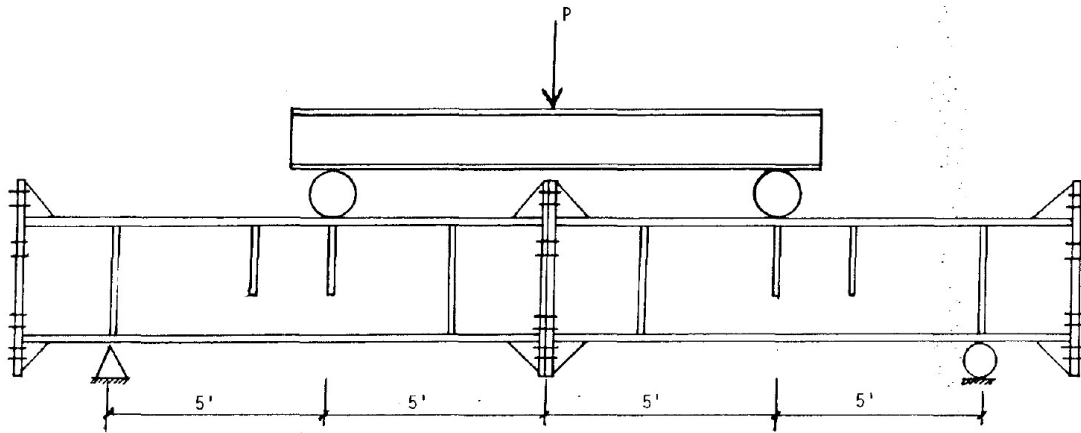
8ES-0.875-1-24 Specimen Dimensions [Ghassemieh, M., Kukreti, A., and Murray, T.M. (1983) *Inelastic Finite Element Analysis of Stiffened End-Plate Moment Connections*, Report No. FSEL/AISC 8302, School of Civil Engineering and Environmental Science, University of Oklahoma, Norman, OK, Used with Permission of T.M. Murray, 2015]
